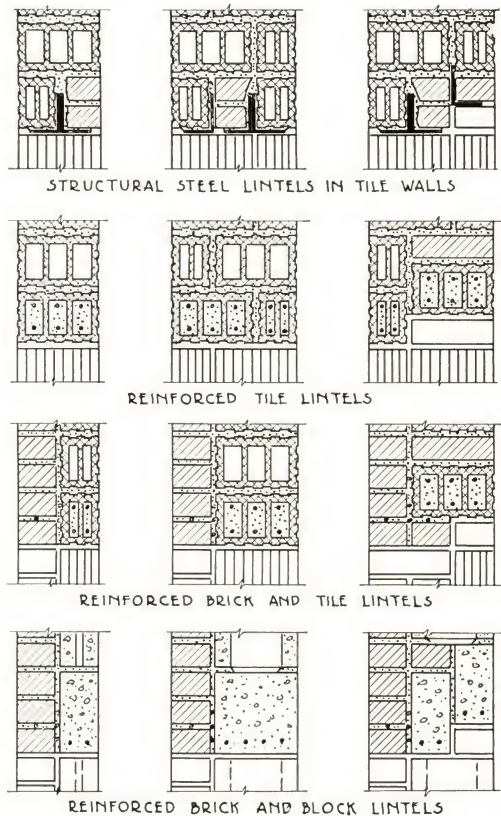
Methods of constructing lintels over openings in tile walls; also, openings in brick walls backed up with hollow tile.
